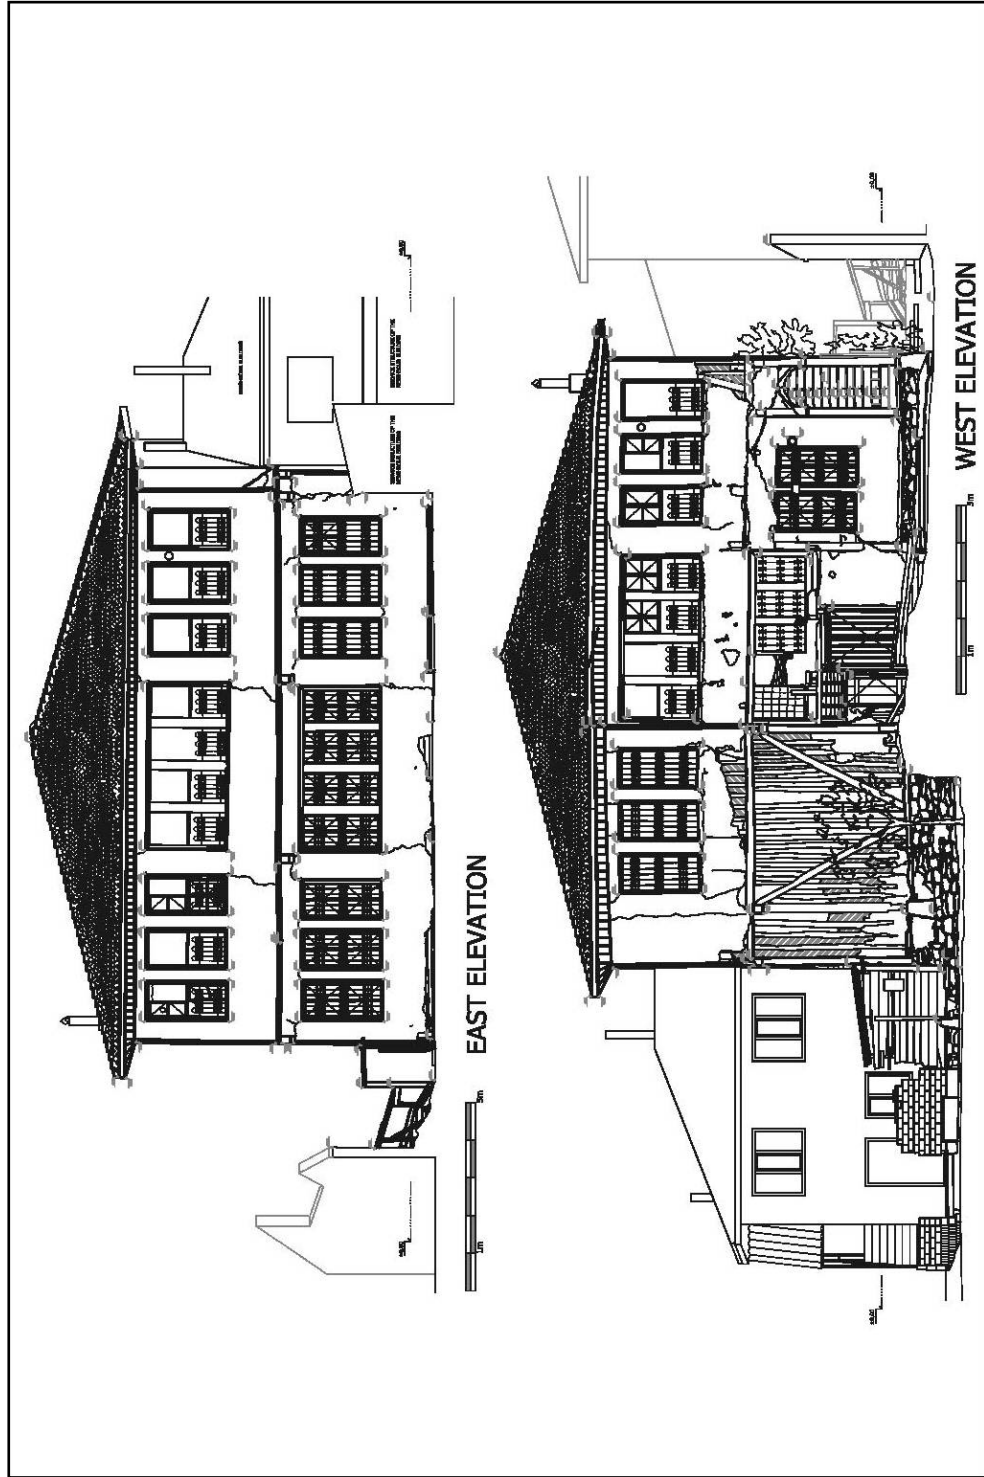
East and West Façades: 1/200 (presented in 1/100 at Jury)
